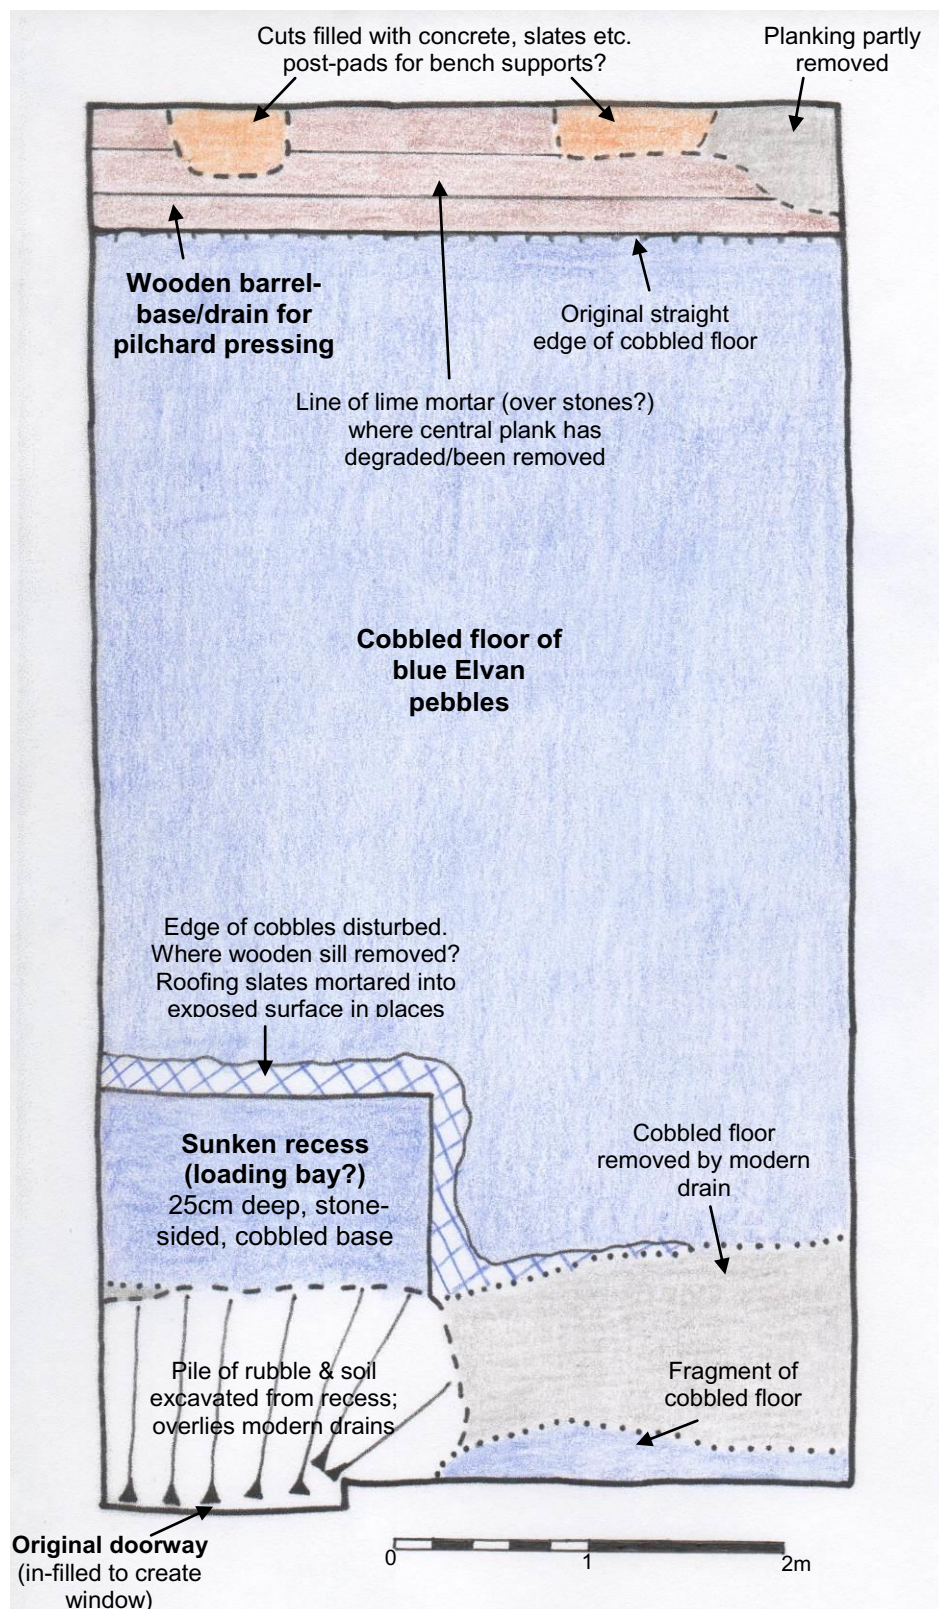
Plan of cellar floor after removal of wooden floor (March 2013)
